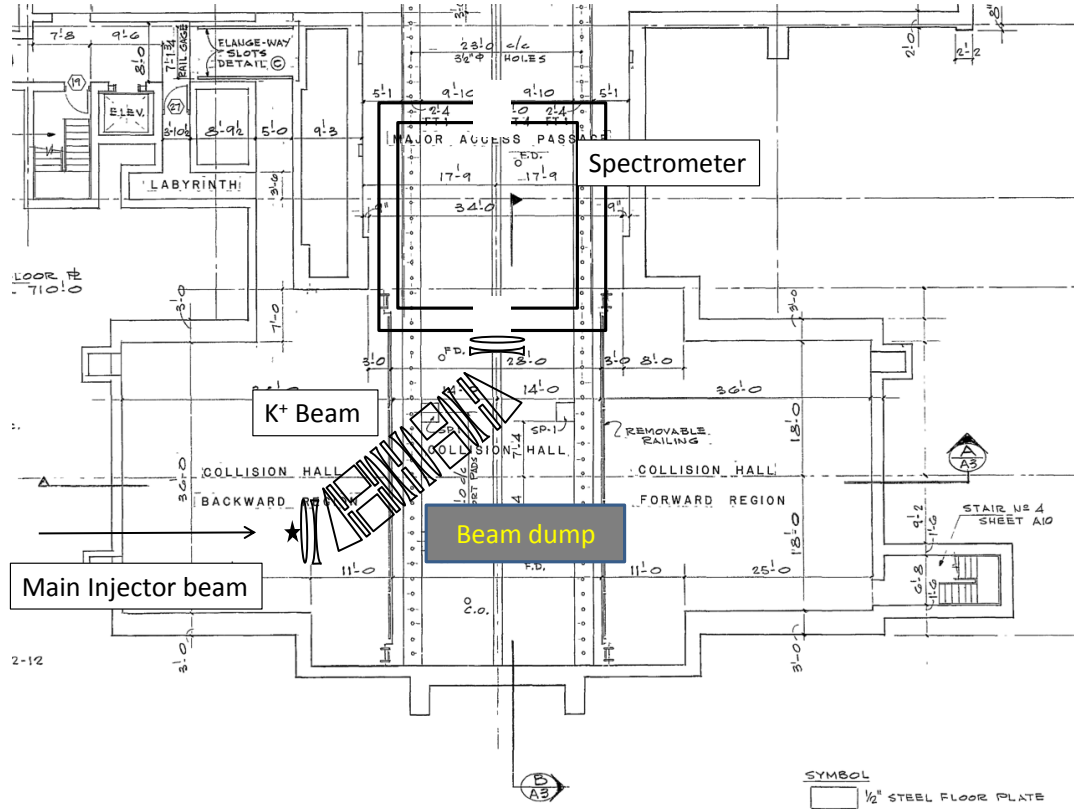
Illustration of the ORKA beam line and detector sited within the B0 collision hall.
